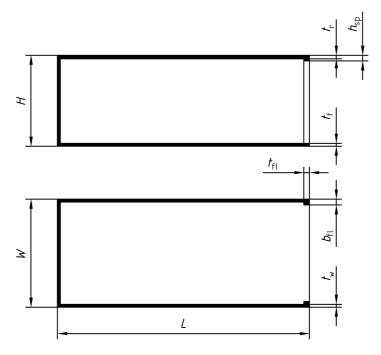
Garage box with door frame (dimensions according to Table E.1)
